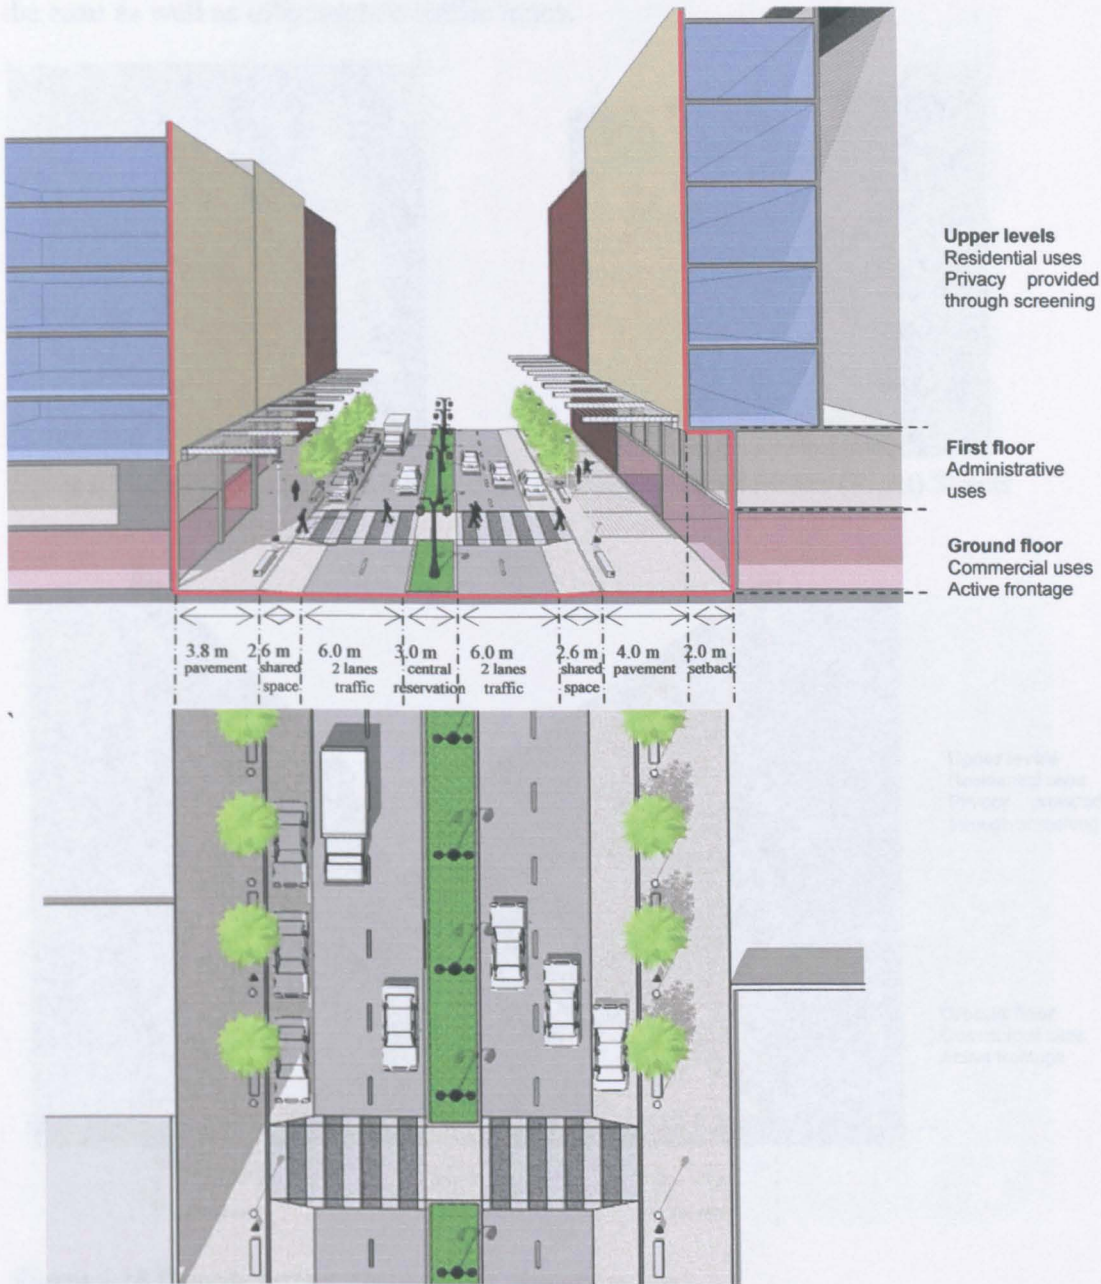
Proposed street treatment Al-Azhar Street, Port-Said Street
